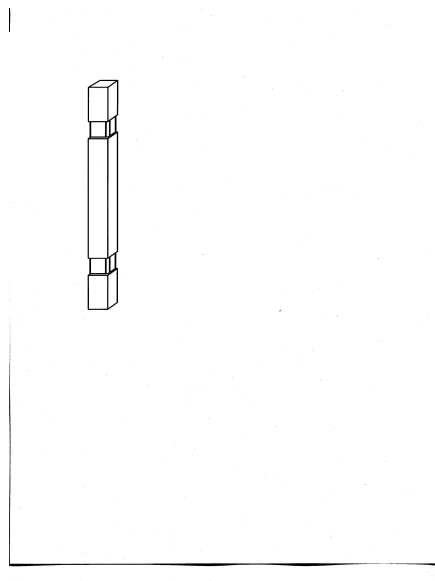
C: Precast reinforced concrete column element; column contains grooves at the slab location
